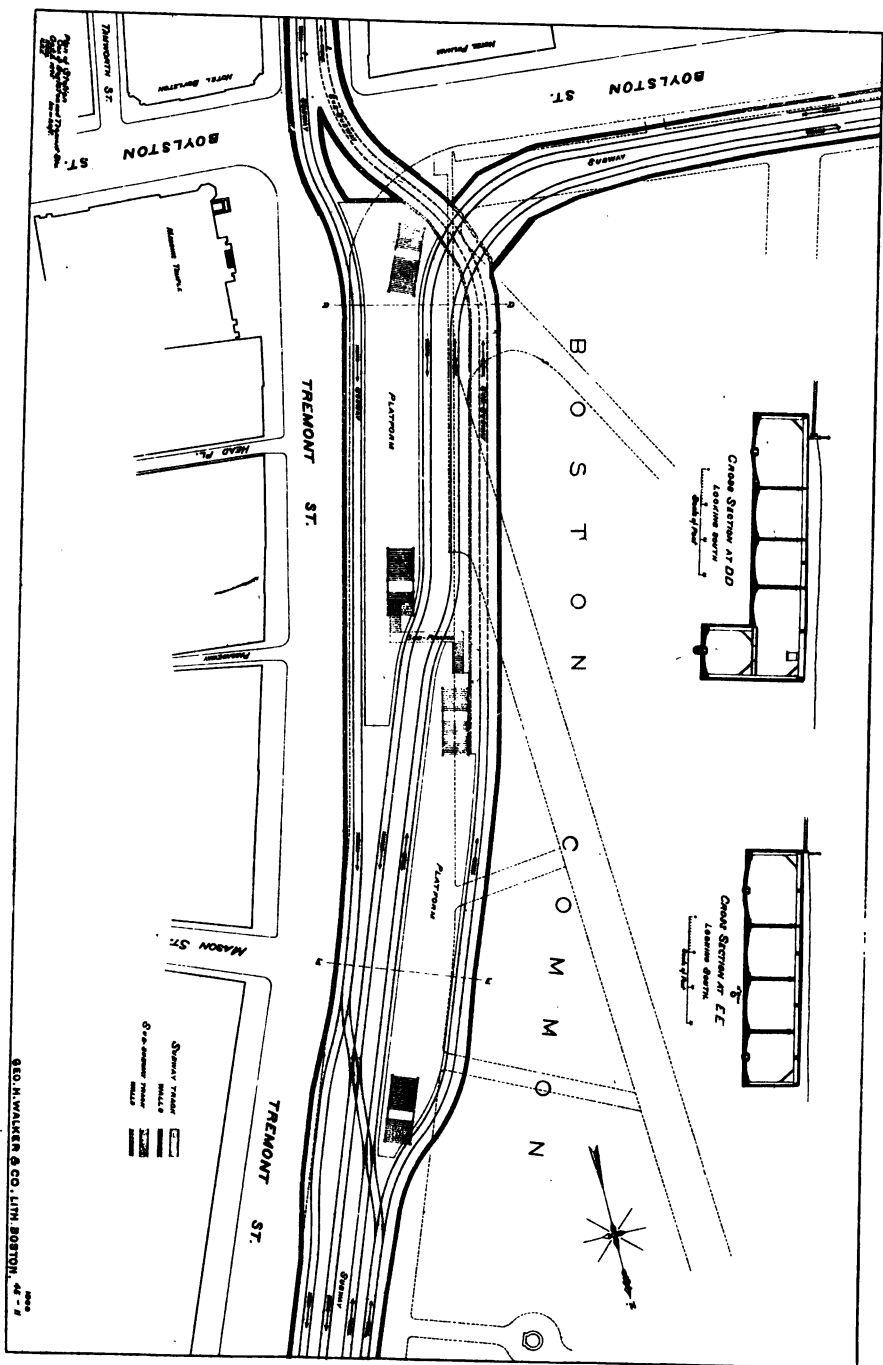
PLAN OF STATION CORNER OF TREMONT AND BOYLSTON STREETS.
